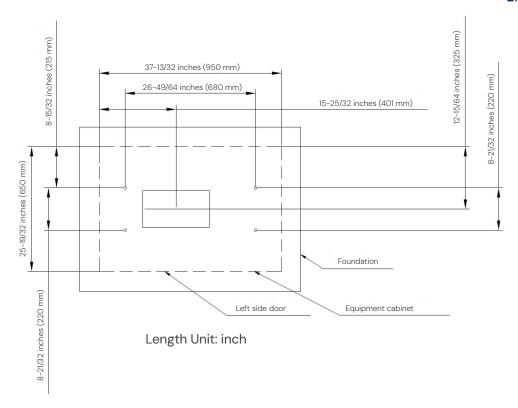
C Hole positions and dimensions of the User Terminal concrete foundation
